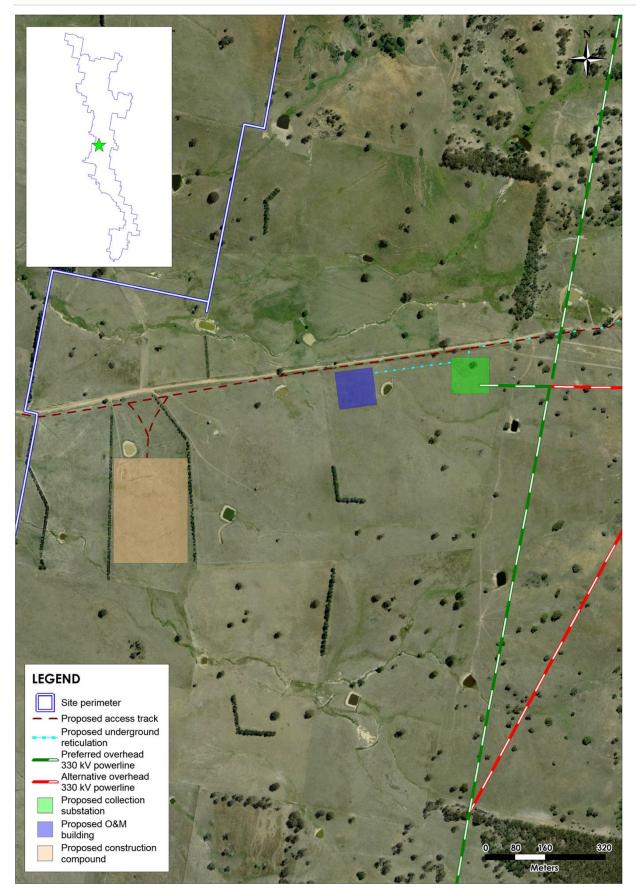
Proposed central wind farm collection substation, construction compound & permanent operation and maintenance facility
